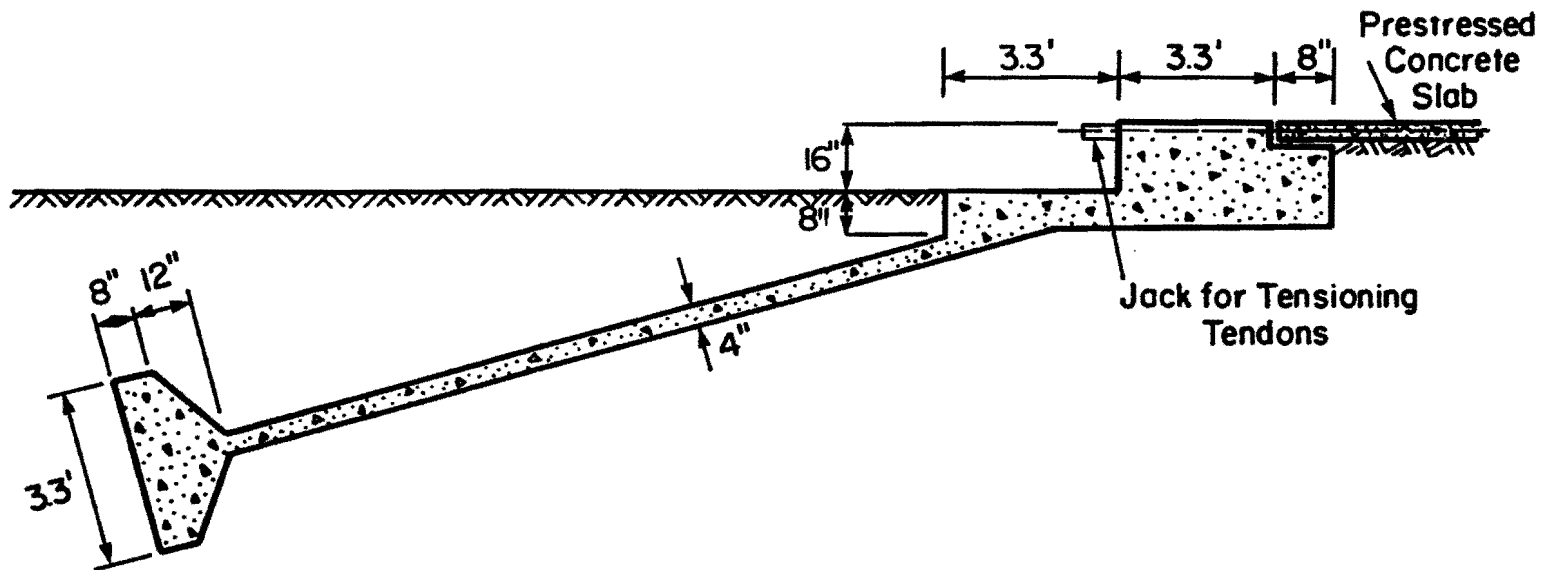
Pretensioning abutment for highway pavement at Cesena, Italy (Ref 56).
